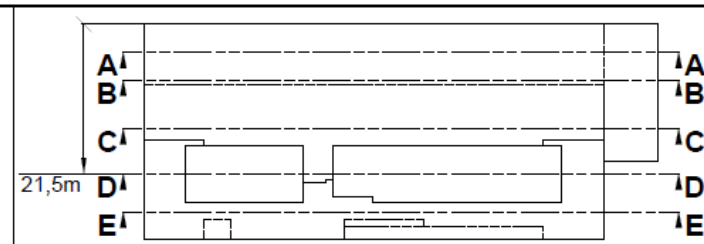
Section view of the tritium plant building at 21.5 m from the TKB.
